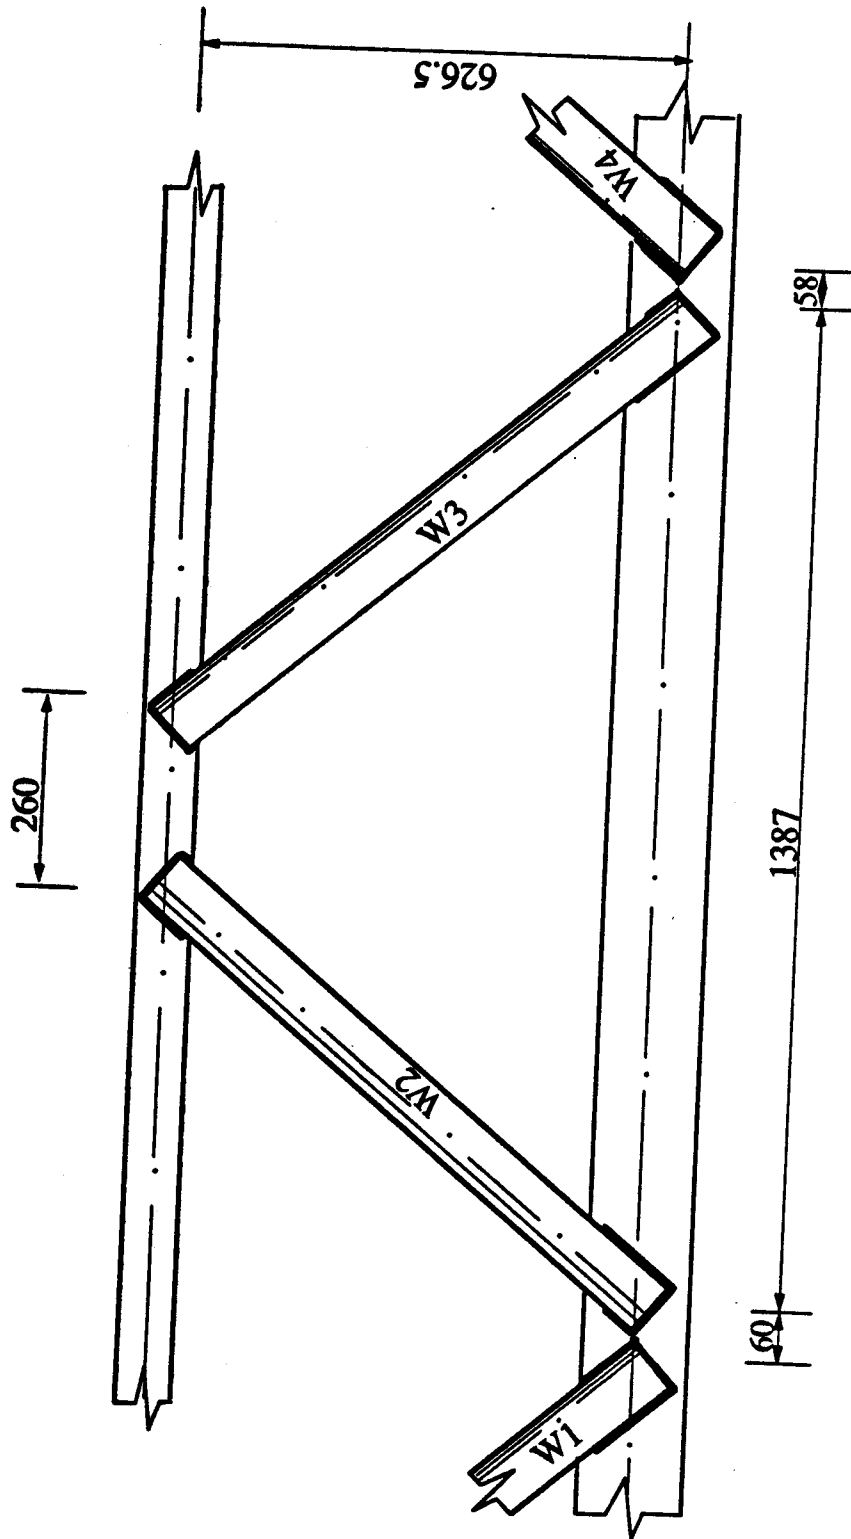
Joint eccentricities and placement of fillet welds
